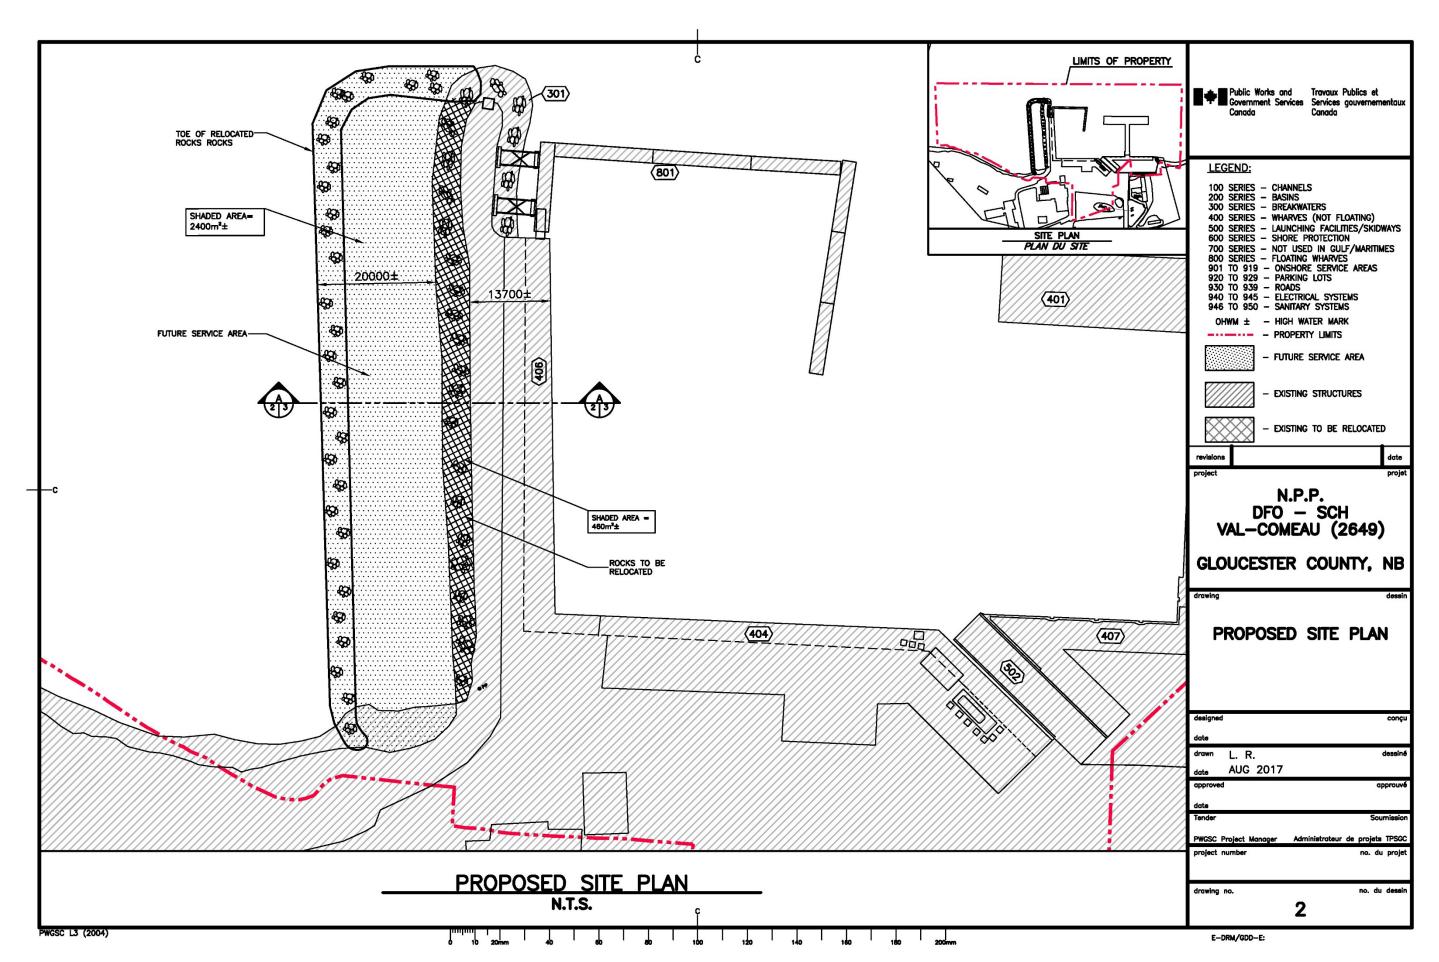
Site plan showing proposed service area construction activities at Val-Comeau DFO-SCH, Gloucester County, New Brunswick
